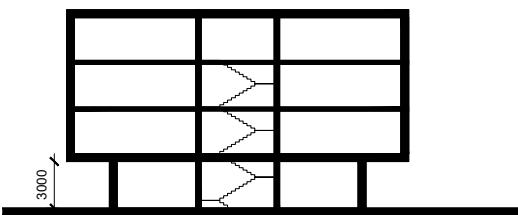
'Pavilion' building raised above ground level with parking or non-habitable shared facilities at ground level.
